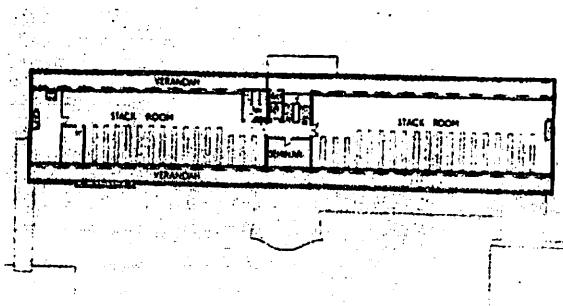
1st Floor Plan of Univ. College Library (Source: Tropical Arch. by M. Fry & J. Drew)
